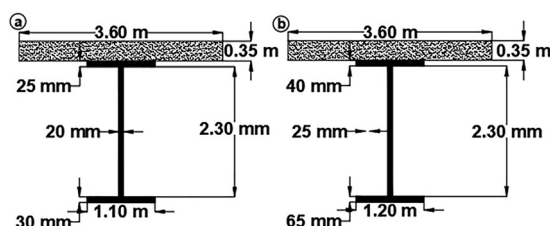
Dimensions and cross-section of composite beams a) in spans, b) in supports
